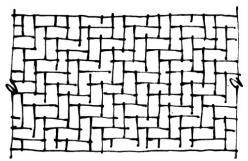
Plan view of a brick sidewalk laid in a herringbone pattern.
